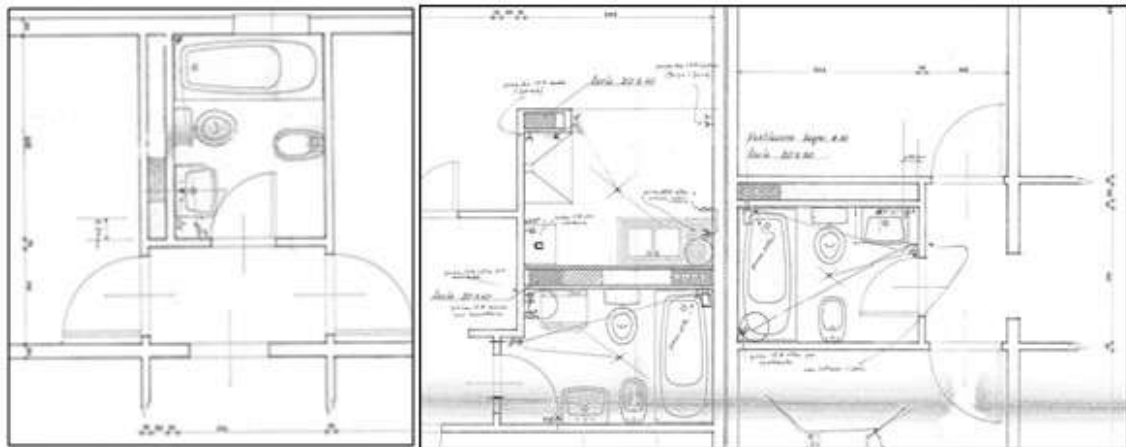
Toilets-LAYOUT A (Left). LAYOUT B (Right) (F108.3T9).
